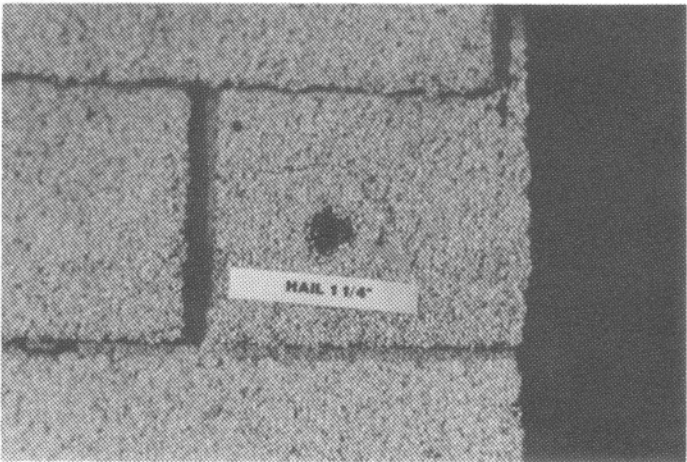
1 1/4 in. hailstone impact/older, three-tab shingle.
